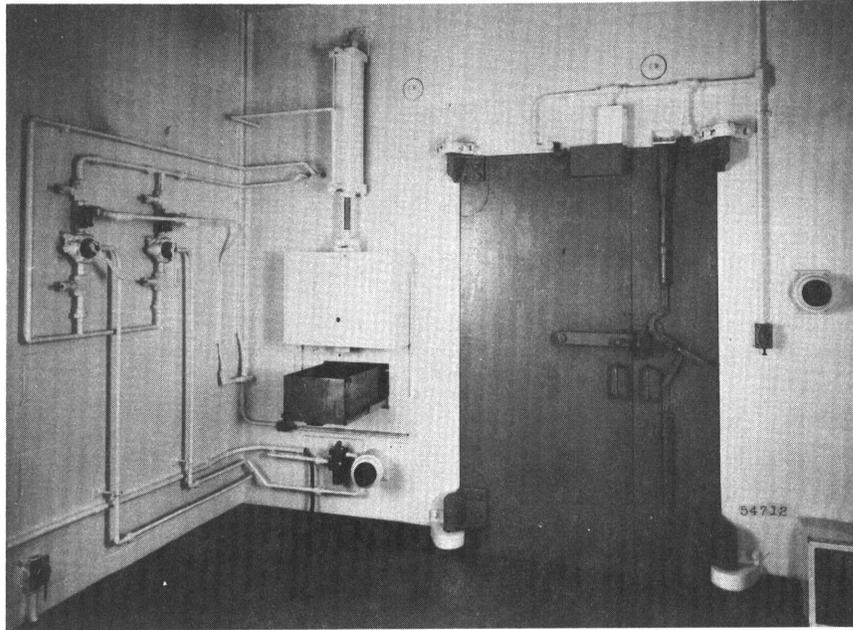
View of double shielding doors to cell 3 in closed position and external transfer drawer arrangement in open position
